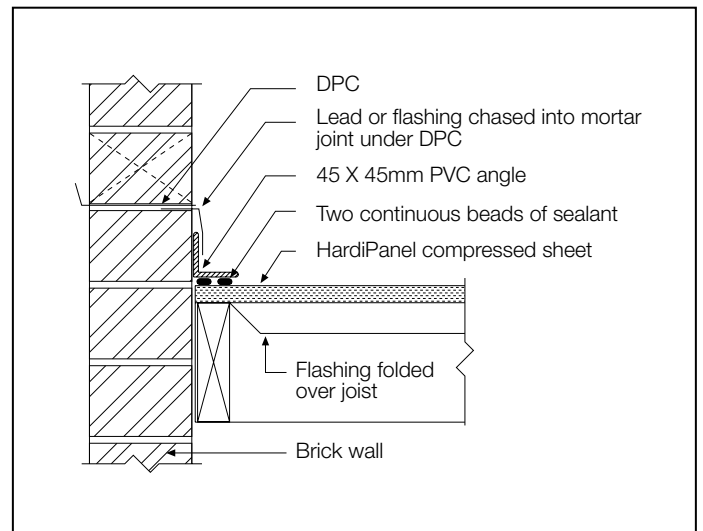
WATER RESISTANT DECK - WALL FLASHING MASONRY DETAIL
